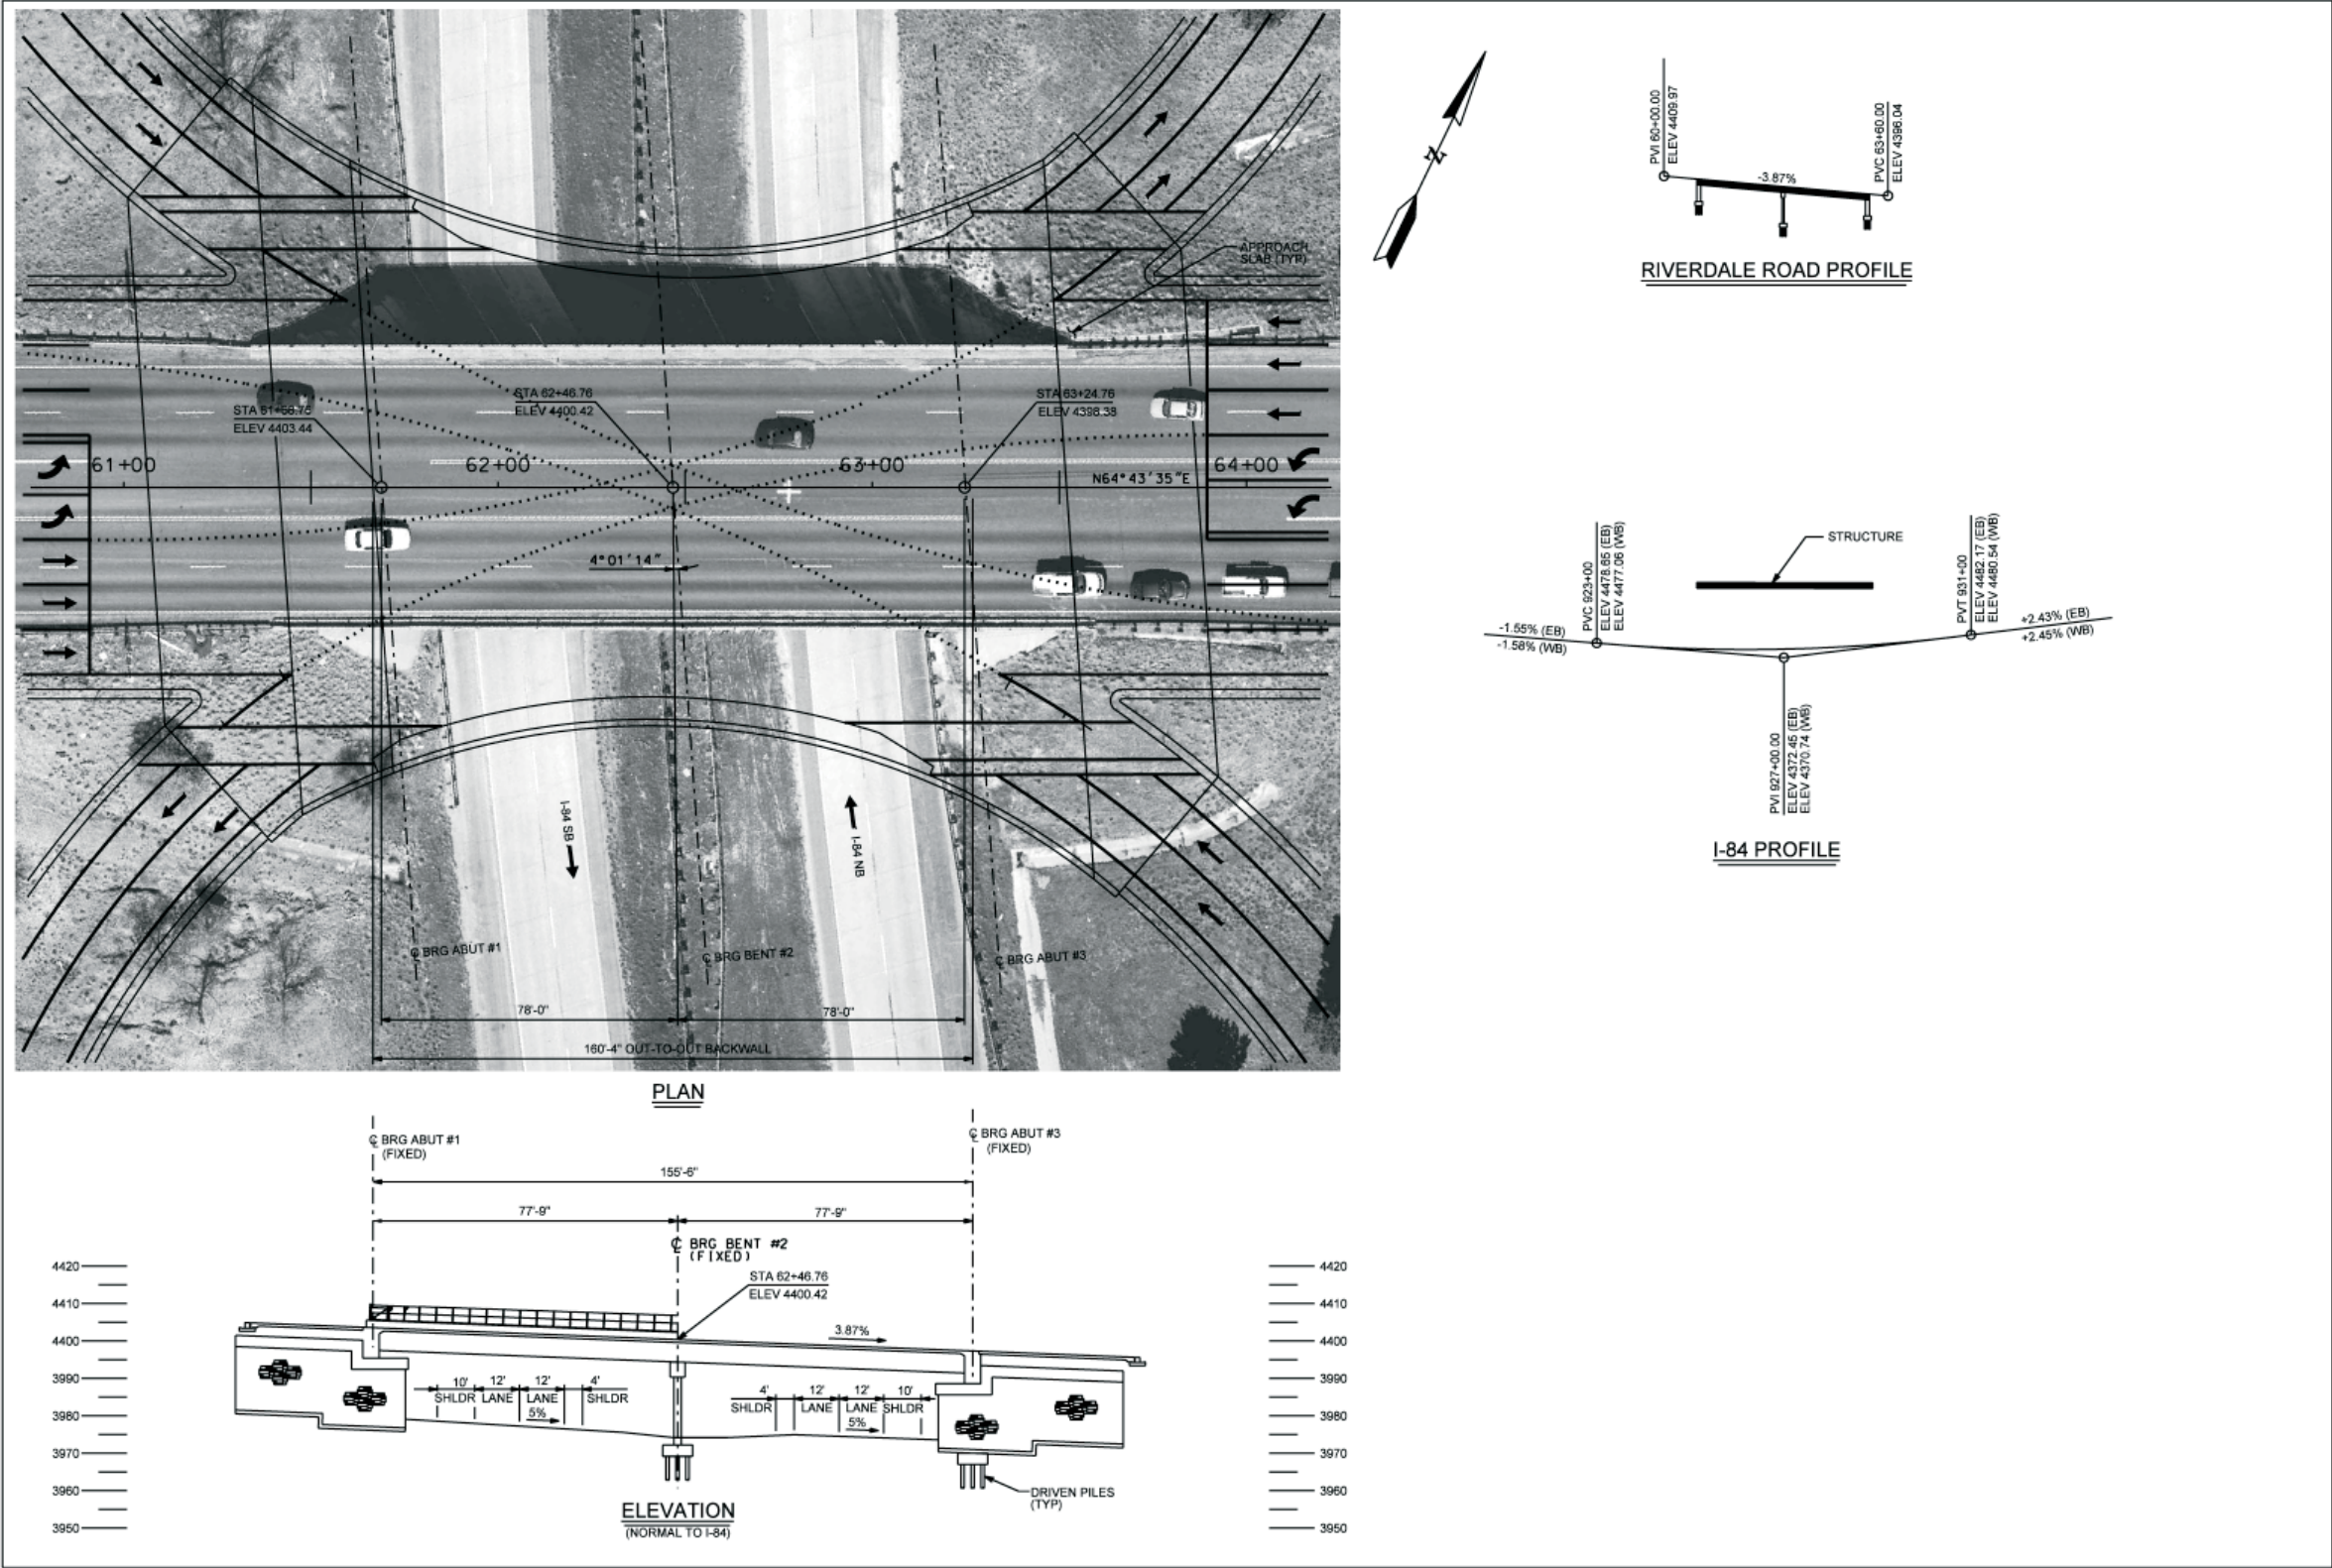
Preliminary Layout of I-84 Bridge (Page 1 of 2).
